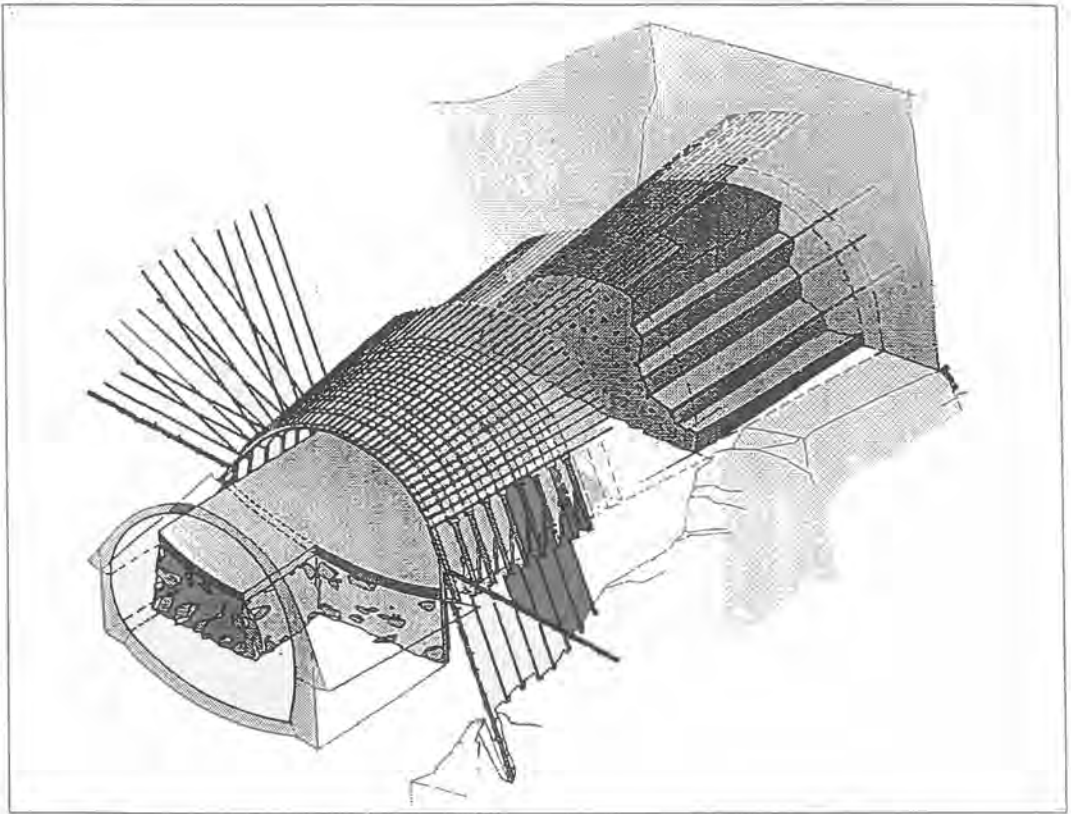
Tunnel advance by steel pipe umbrella arch, face reinforcement and subsequent steps in final excavation and support
